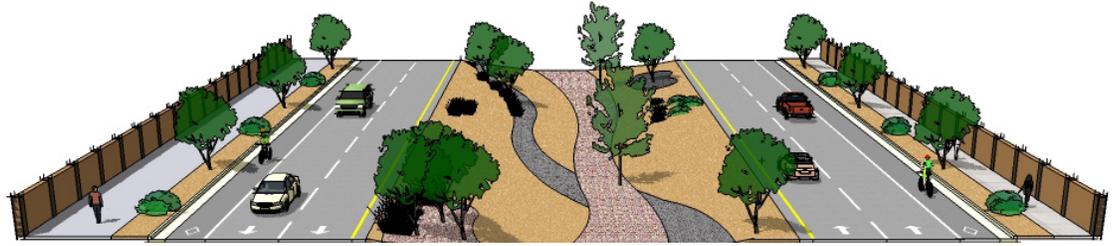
d: Southern Avenue Proposal (Elizabeth Street to Juan Tabo Boulevard)
